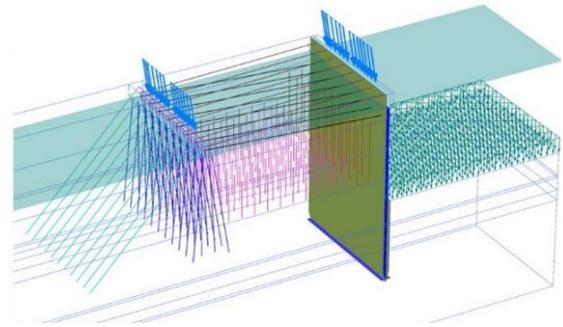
FEM Plaxis model of the quay wall structure with the rear crane beam and foundation elements
